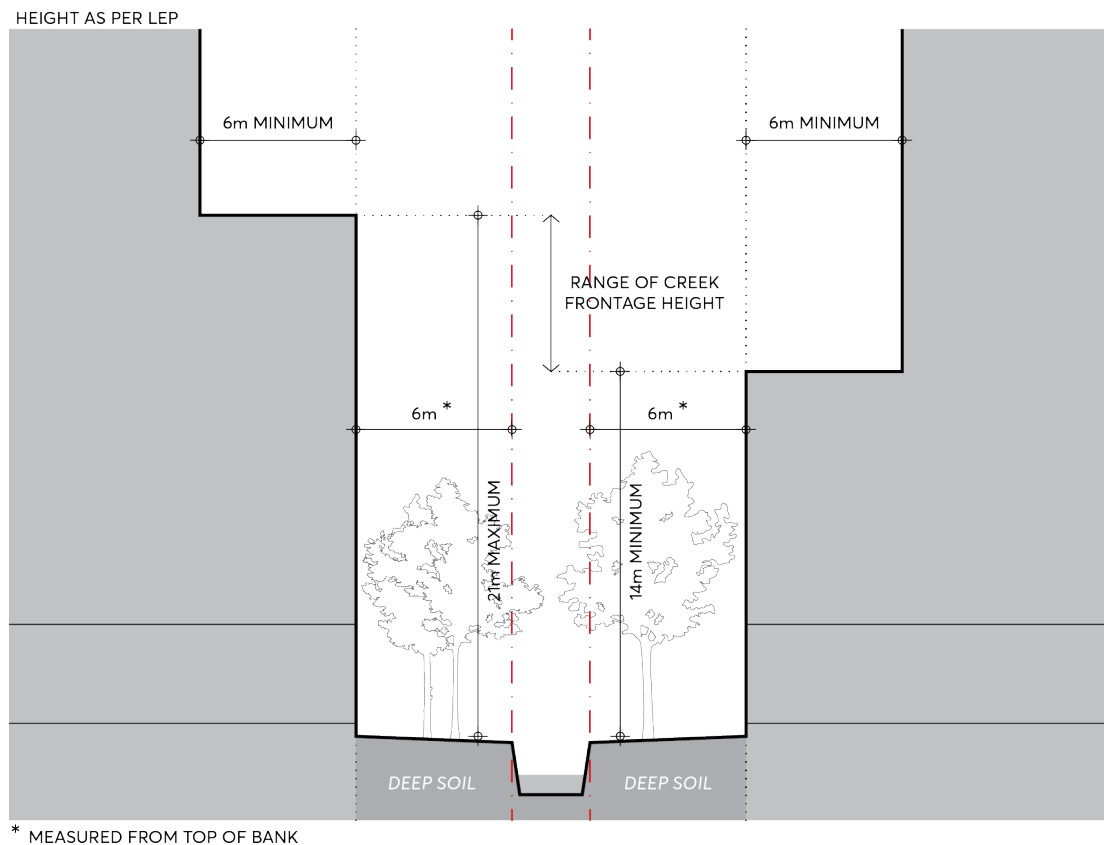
Creek Corridor Setbacks and Street Wall Height
